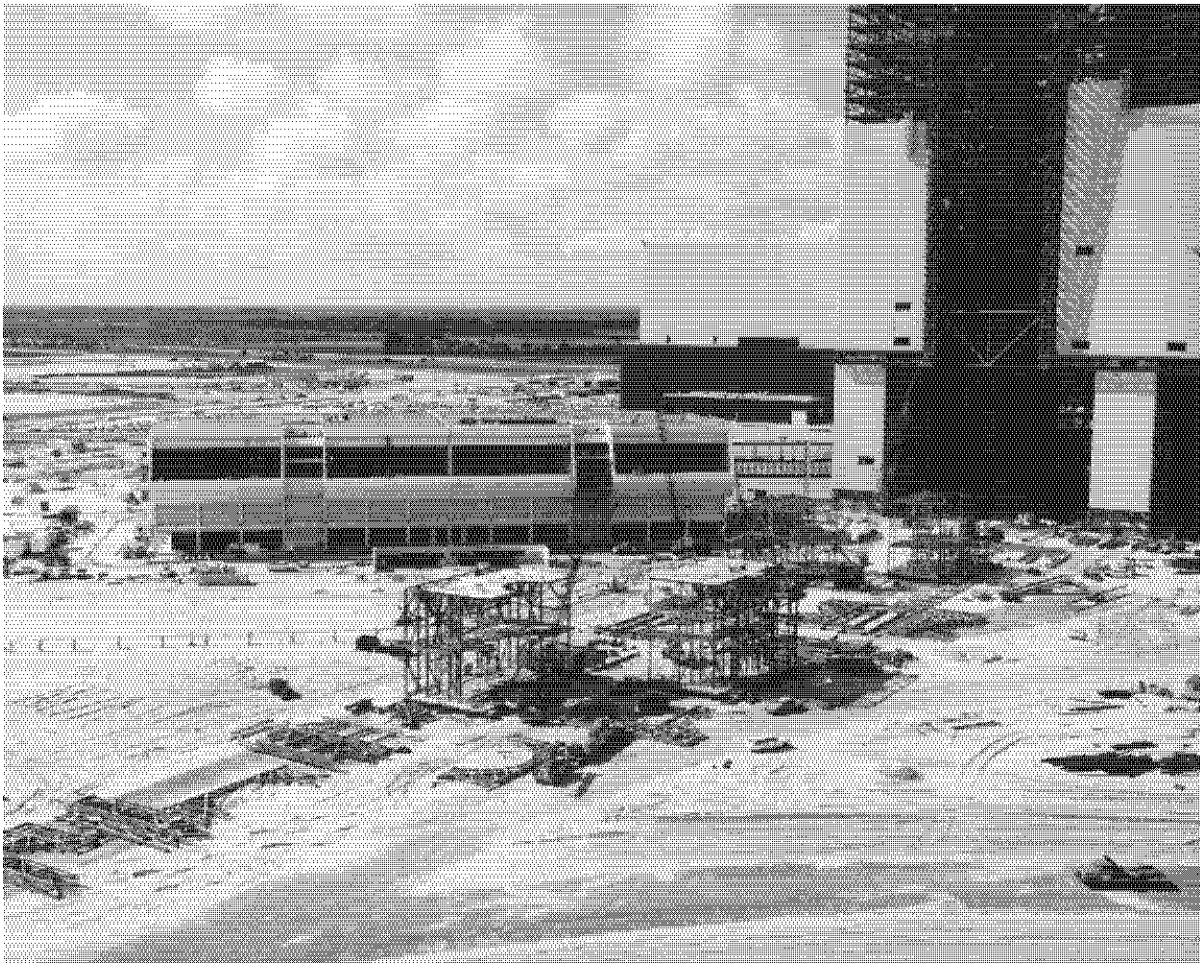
Construction on Launch Control Center and Vehicle Assembly Building Work Platforms, Complex 39, February 11, 1965.
